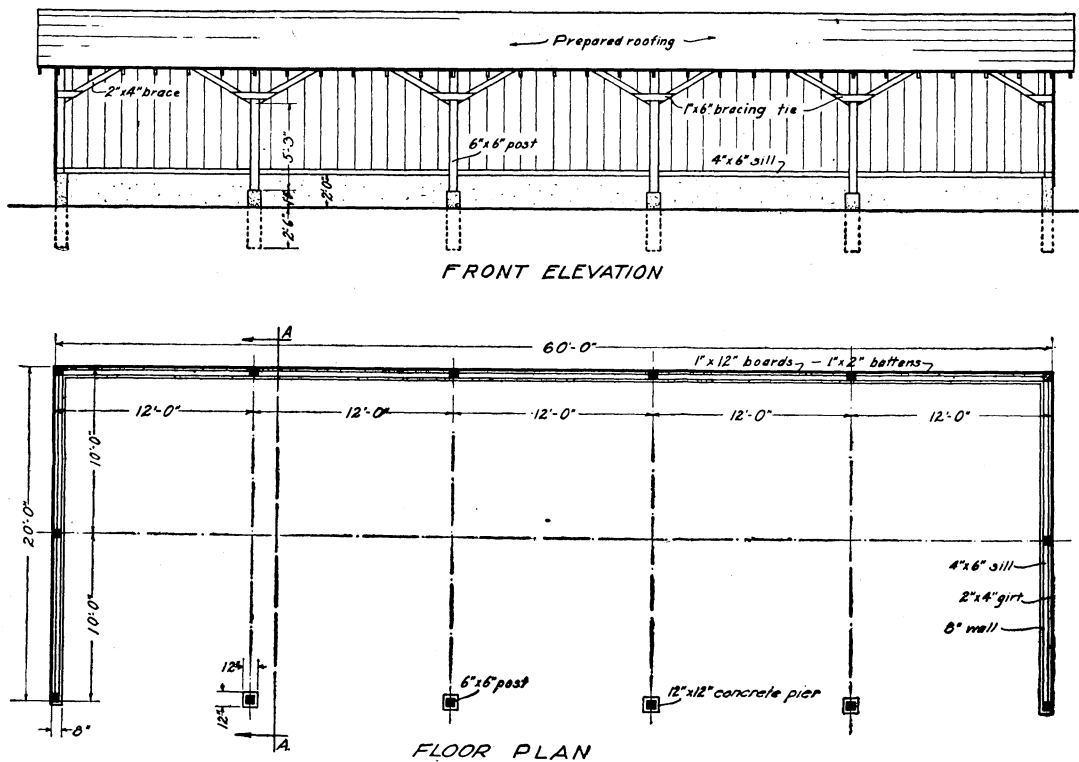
Front elevation and floor plan of open shed (design No. 2198)
